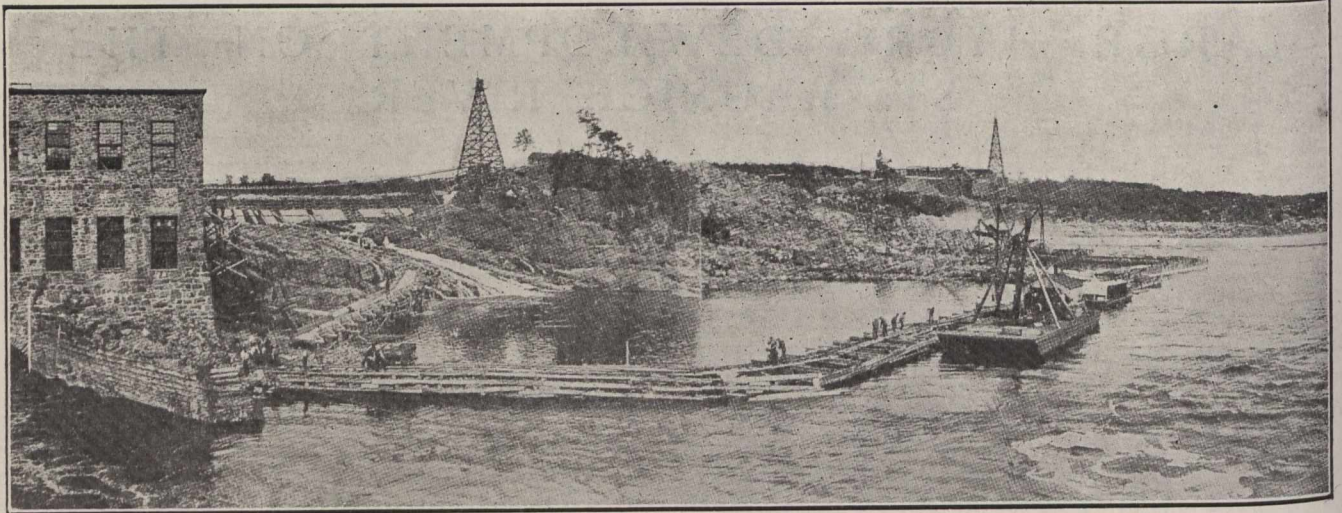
General View, Showing Present Power House and Dam, One of the Cable Towers, Cofferdam Under Construction, Main Island, Crushing and Mixing Plant, and the Main Channel of the St. Maurice.
